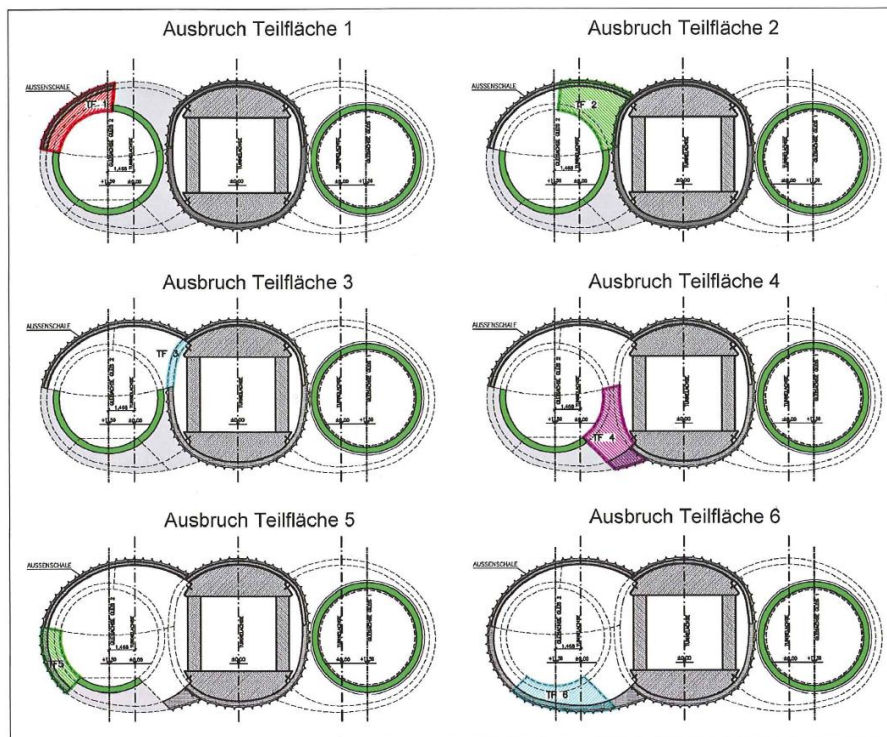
Excavation sequence station Museumsinsel, Berlin
